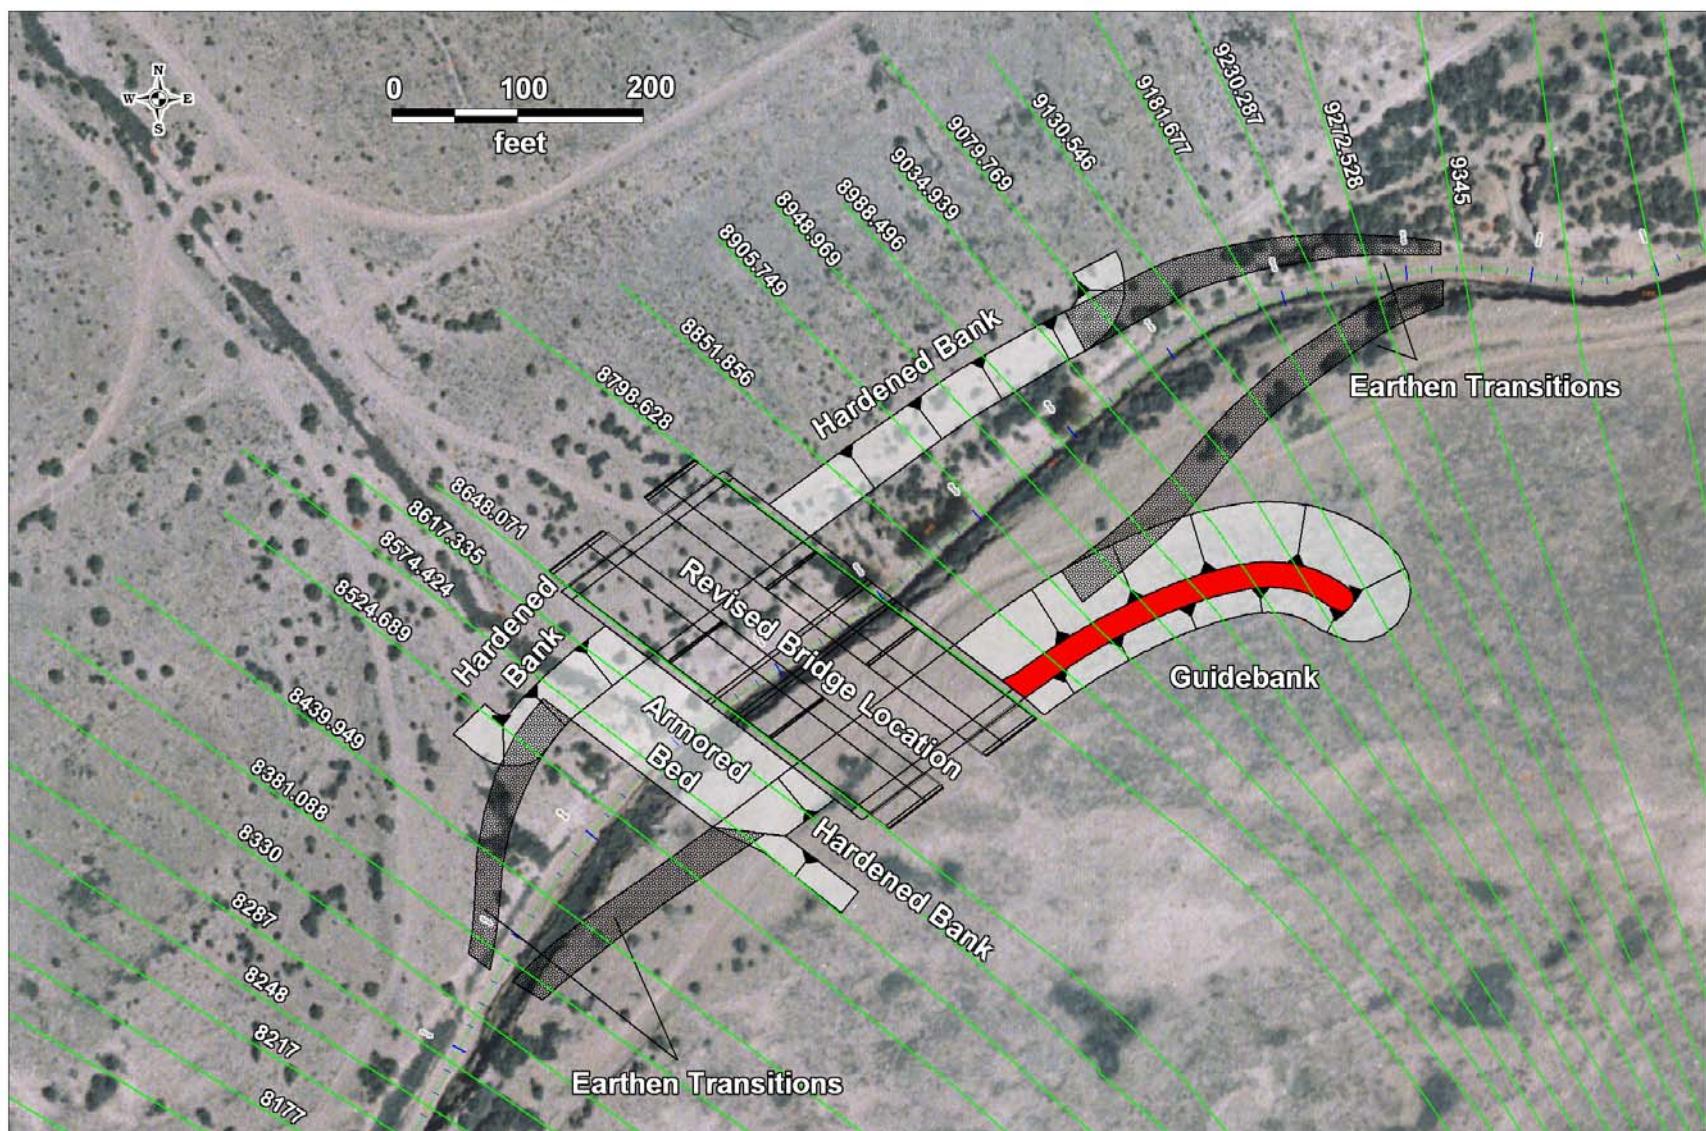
Proposed scour countermeasures and unlined channel transitions in the vicinity of the bridge.
